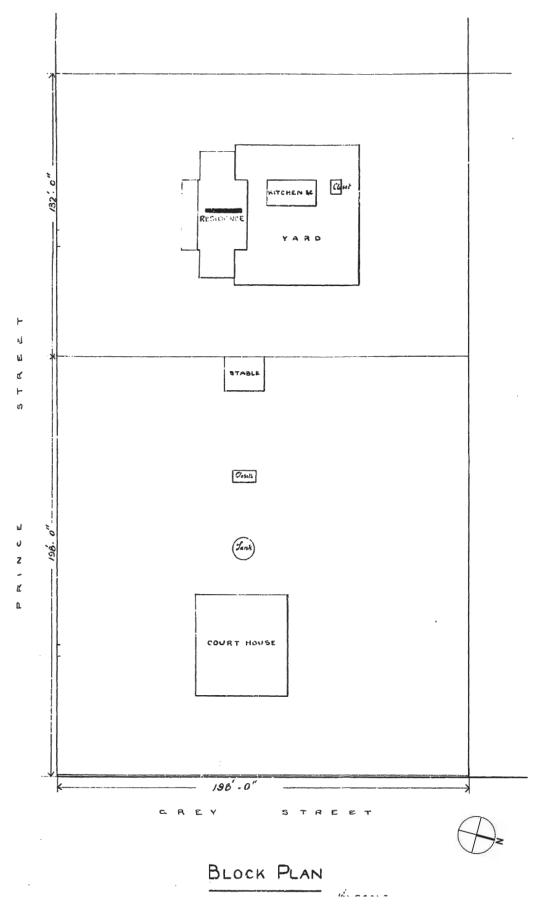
Site plan of Clarence Town Courthouse and Police Residence site, c. 1879 (Source: Department of Finance, Services and Innovation, Record Number PC129_2)
